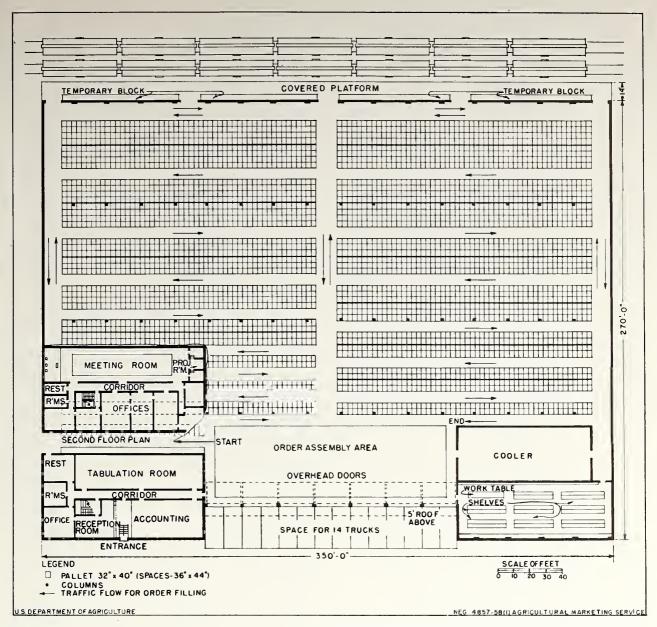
Suggested plans for a dry grocery warehouse showing a schematic diagram of pallet stacking and traffic flow.
